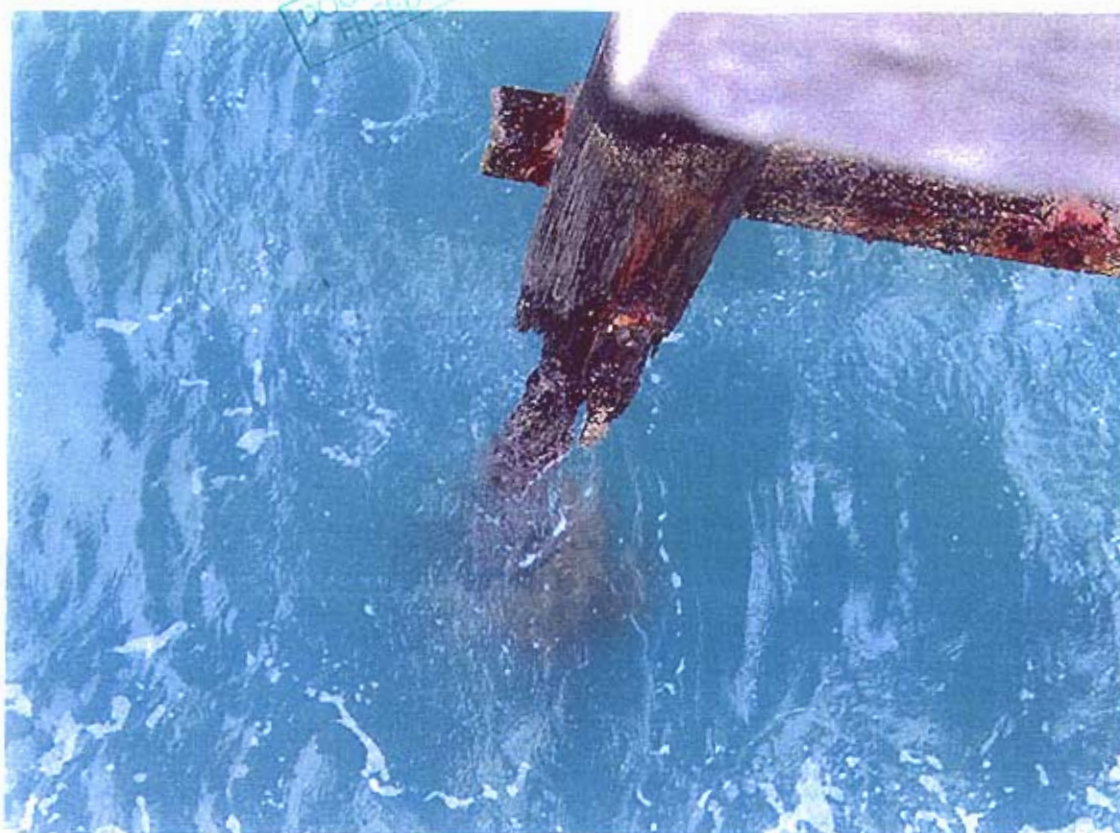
Heavy Pile "Necking" – Bent 47, Eastern Side
